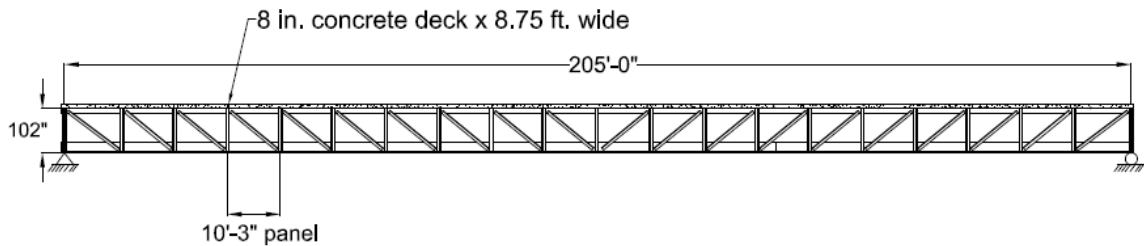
205 ft. Bolted/Welded Steel Truss Girder Elevation View
